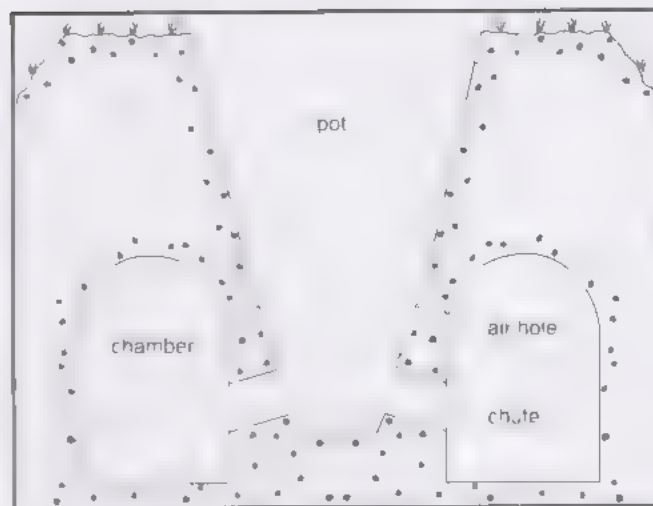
A cross-section of an old Norfolk lime-kiln. When seen in three-dimensions, the sections of chamber to left and right are joined to form a circular room with an arched roof centred on, and surrounding, the lower third of the pot.
